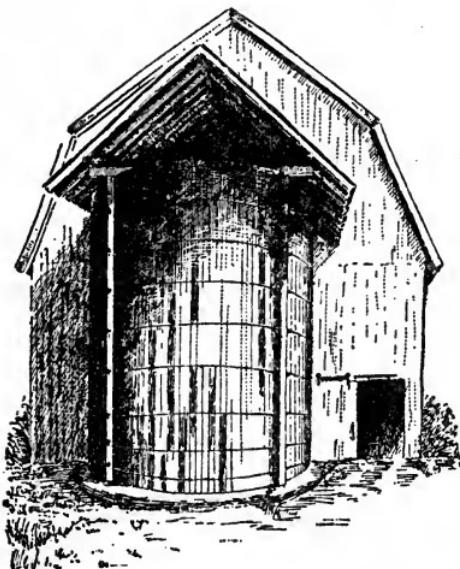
A cheap roof of a stave silo. (Clinton.)
